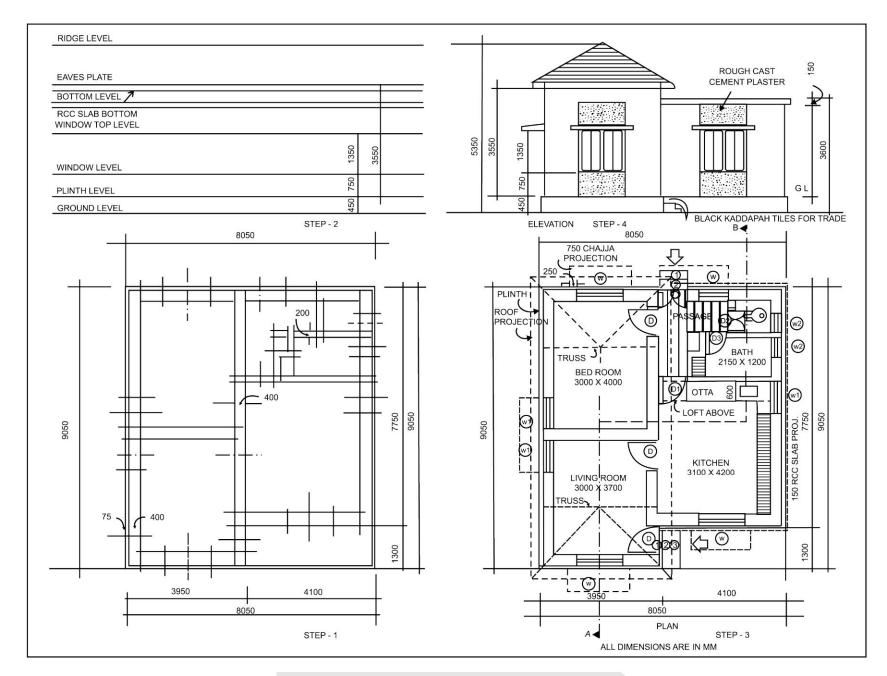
Development of Plan and Elevation—Load Bearing Structure
